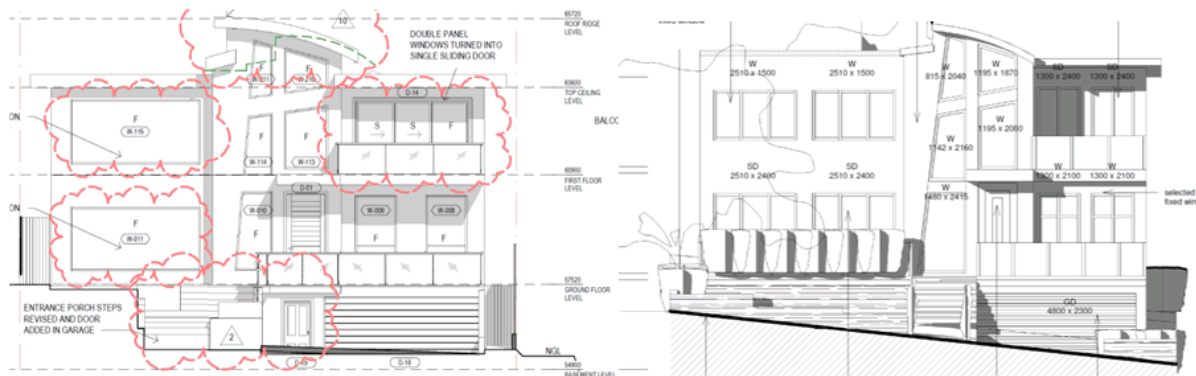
West elevation. The current elevation on site (left) & the previously approved elevation under DA/380/2017 (right). Source: dvyne design.
